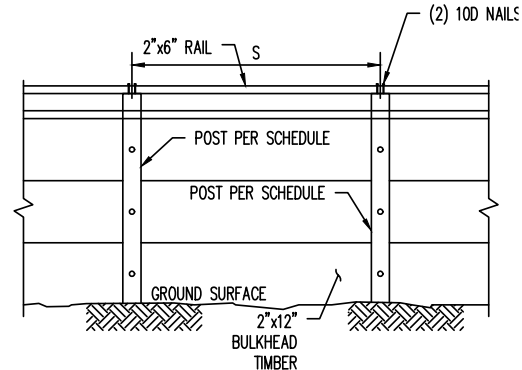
TIMBER REINFORCED BERM CROSS BRACE PLAN VIEW
